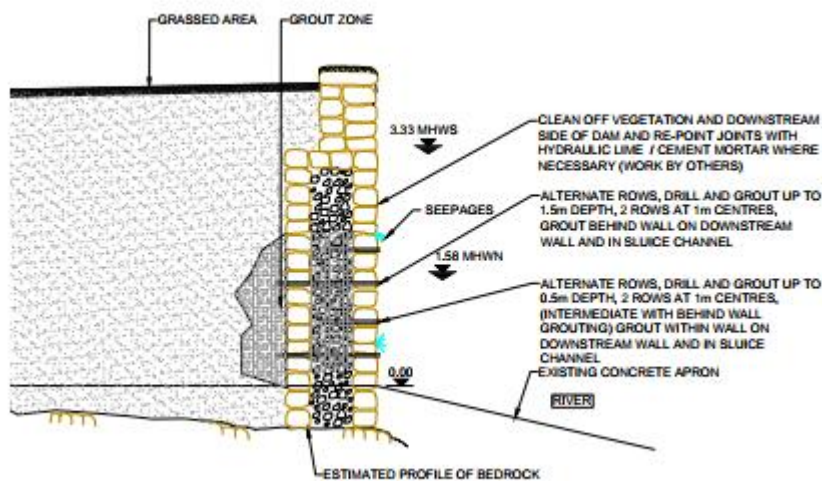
Grouting repairs for causeway walls at the Sluice (Drawing 5129589.016-ATK-ZZ-ZZ-DR-D-0003-P06)
